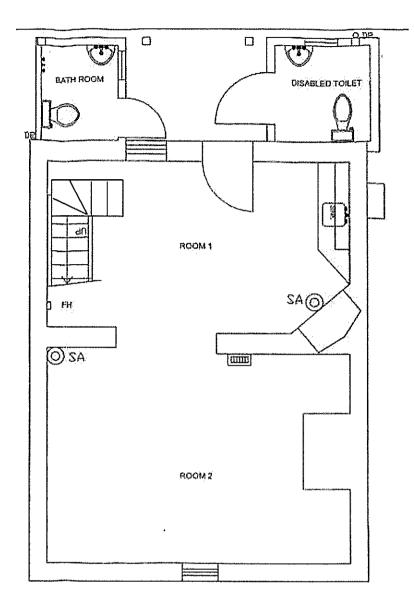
Lower Ground Floor - As Built Drawing Source: City of Ryde Property Files
